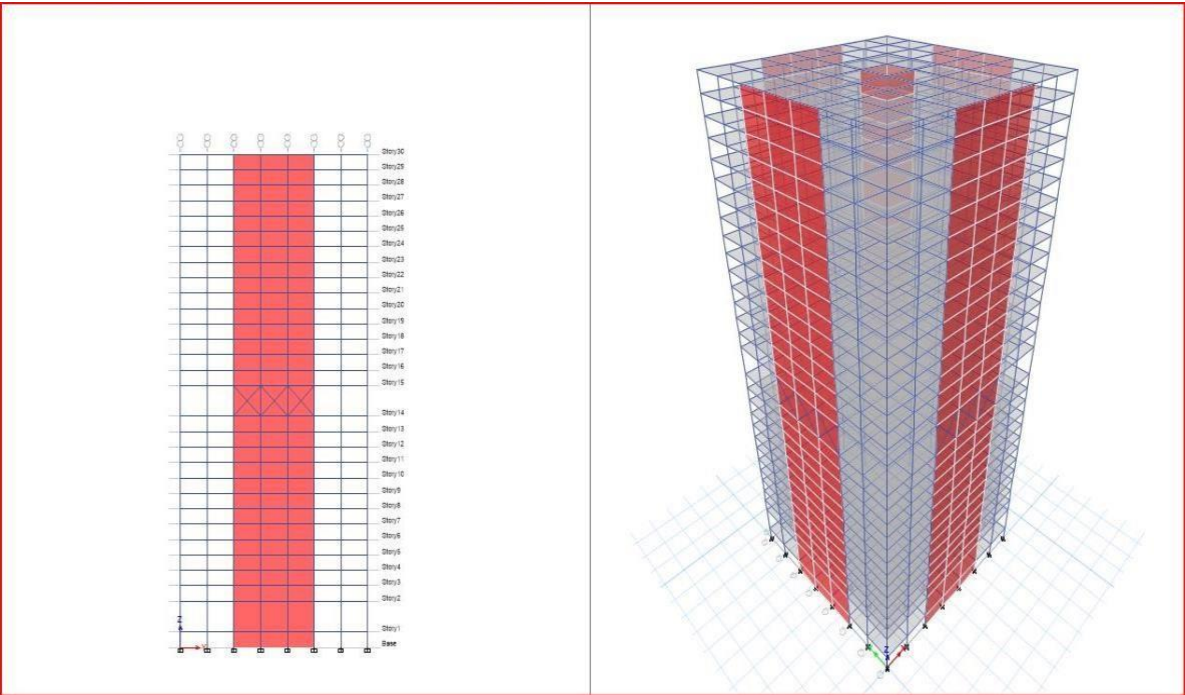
Elevation and 3-D view of Soft Story model with diagonal stiffeners at mid for G+30
